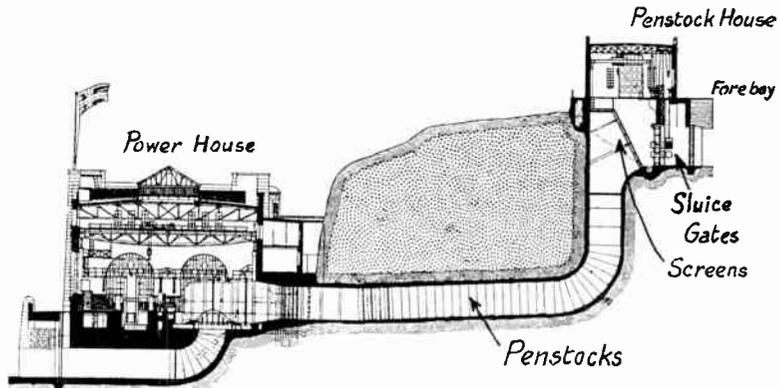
CROSS-SECTION OF POWER HOUSE AND PENSTOCK HOUSE AT TROLLHÄTTAN.
